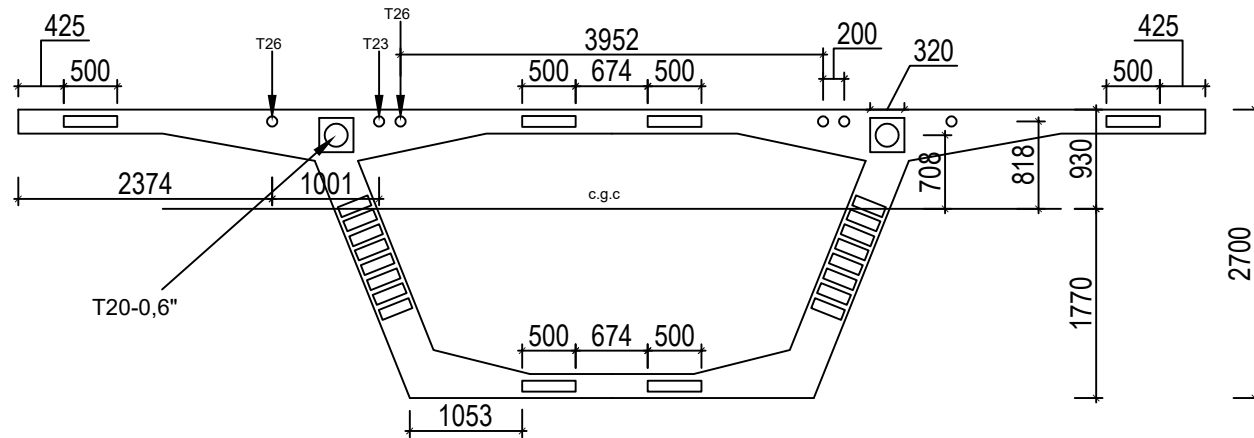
DETAIL BOX GIRDER SEGMENT 4 & 4L (S4 & S4L)
